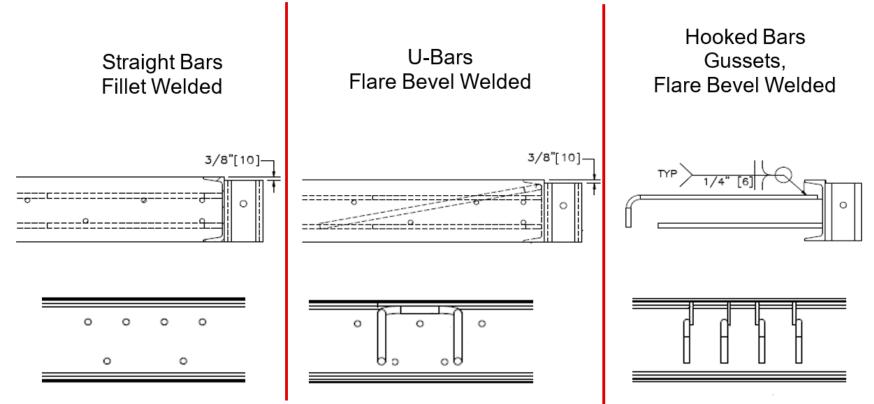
Welded Socket Attachment with (a) Straight Bar Anchorage, (b) U-bar Anchorage, and (c) Gussets and Hook Bar Anchorage
